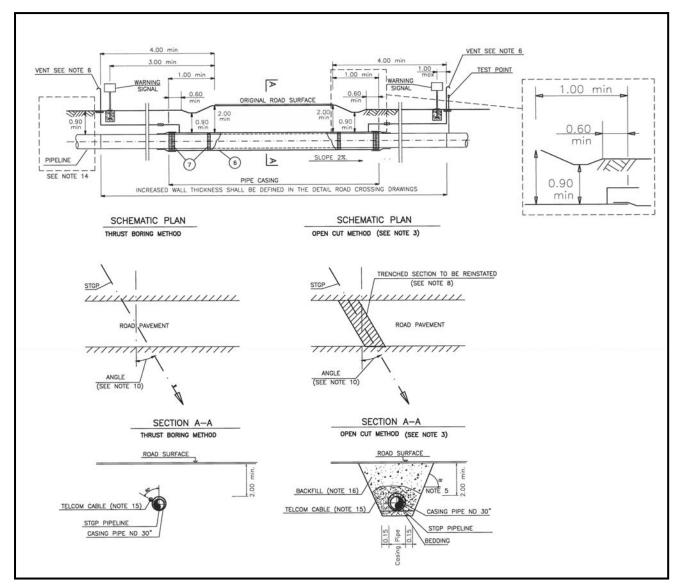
Cross Section of the Pipeline Crossing Roads
